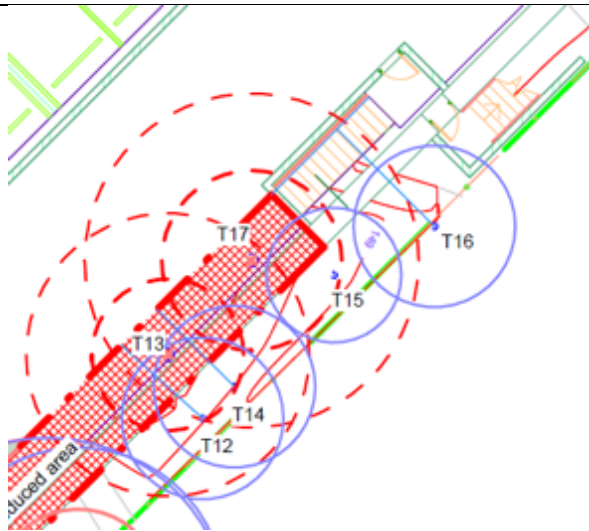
Basement 1 Plan – Tree 12 - Showing suspended slab (couter level).
